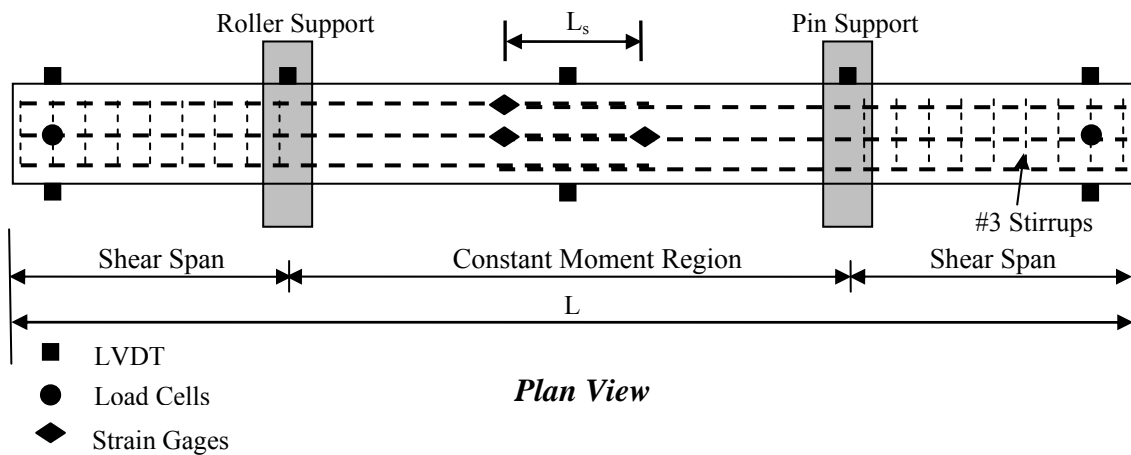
Plan View of Instrumentation Layout (Phase I)
